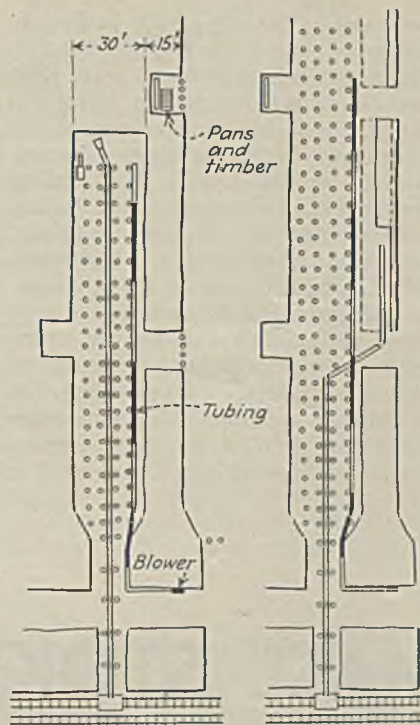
Left, room-driving plan; right, method of slabbing room pillars
